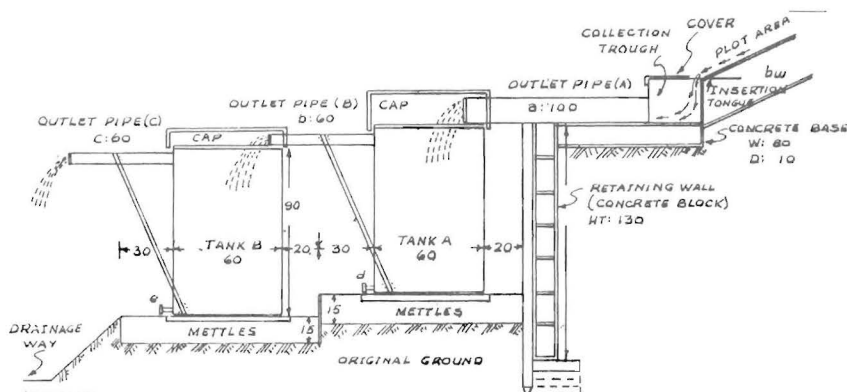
Side view of tank A & B, outlet pipe a, b, c, d, e, trough, retaining wall, and concrete base (unit: cm).
